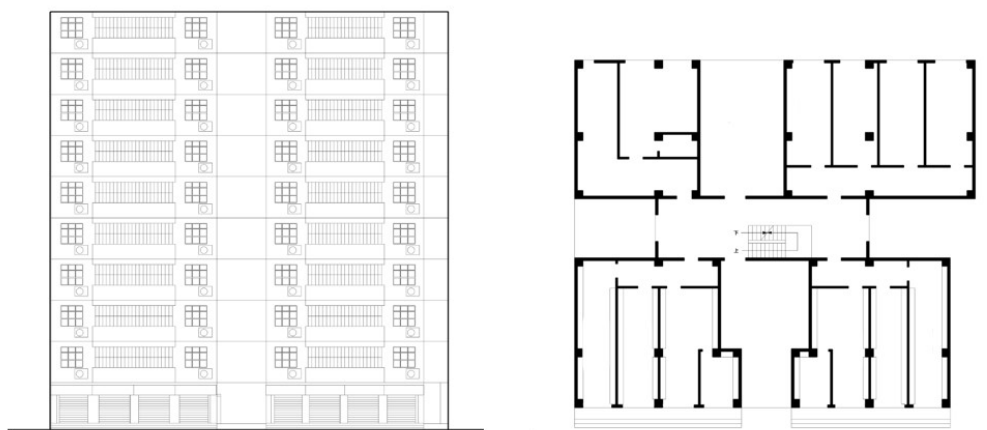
Typical Multi story Residential Building Plan and Elevation
